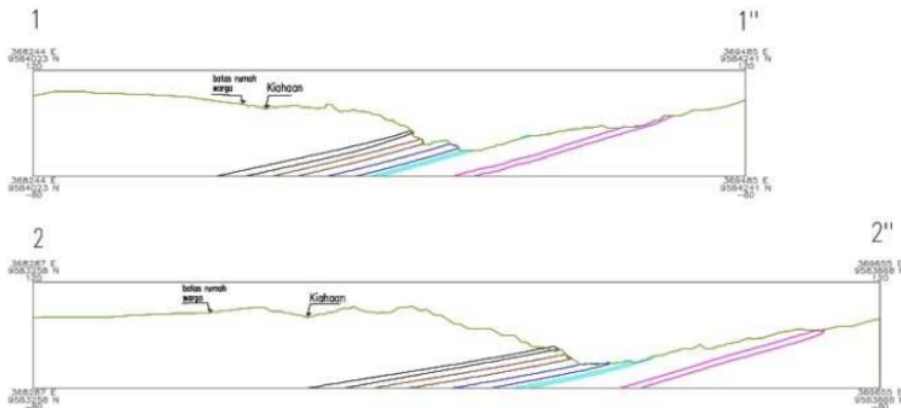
Section of Geometry Bench Pit 1 West Banko
